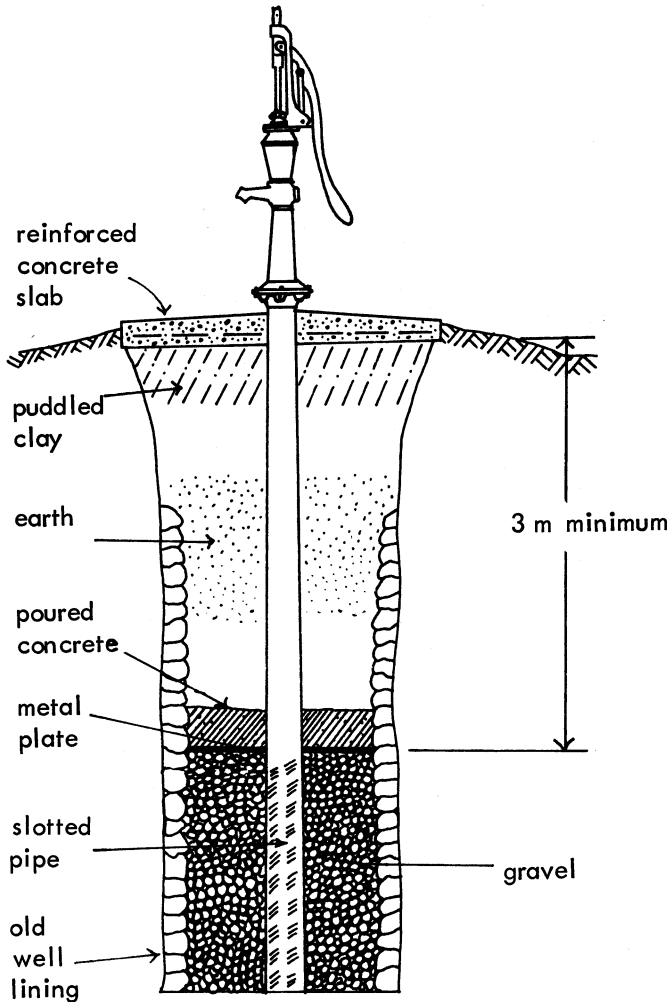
A hand-dug well converted into a tube well. (After Wagner and Lanoix).
